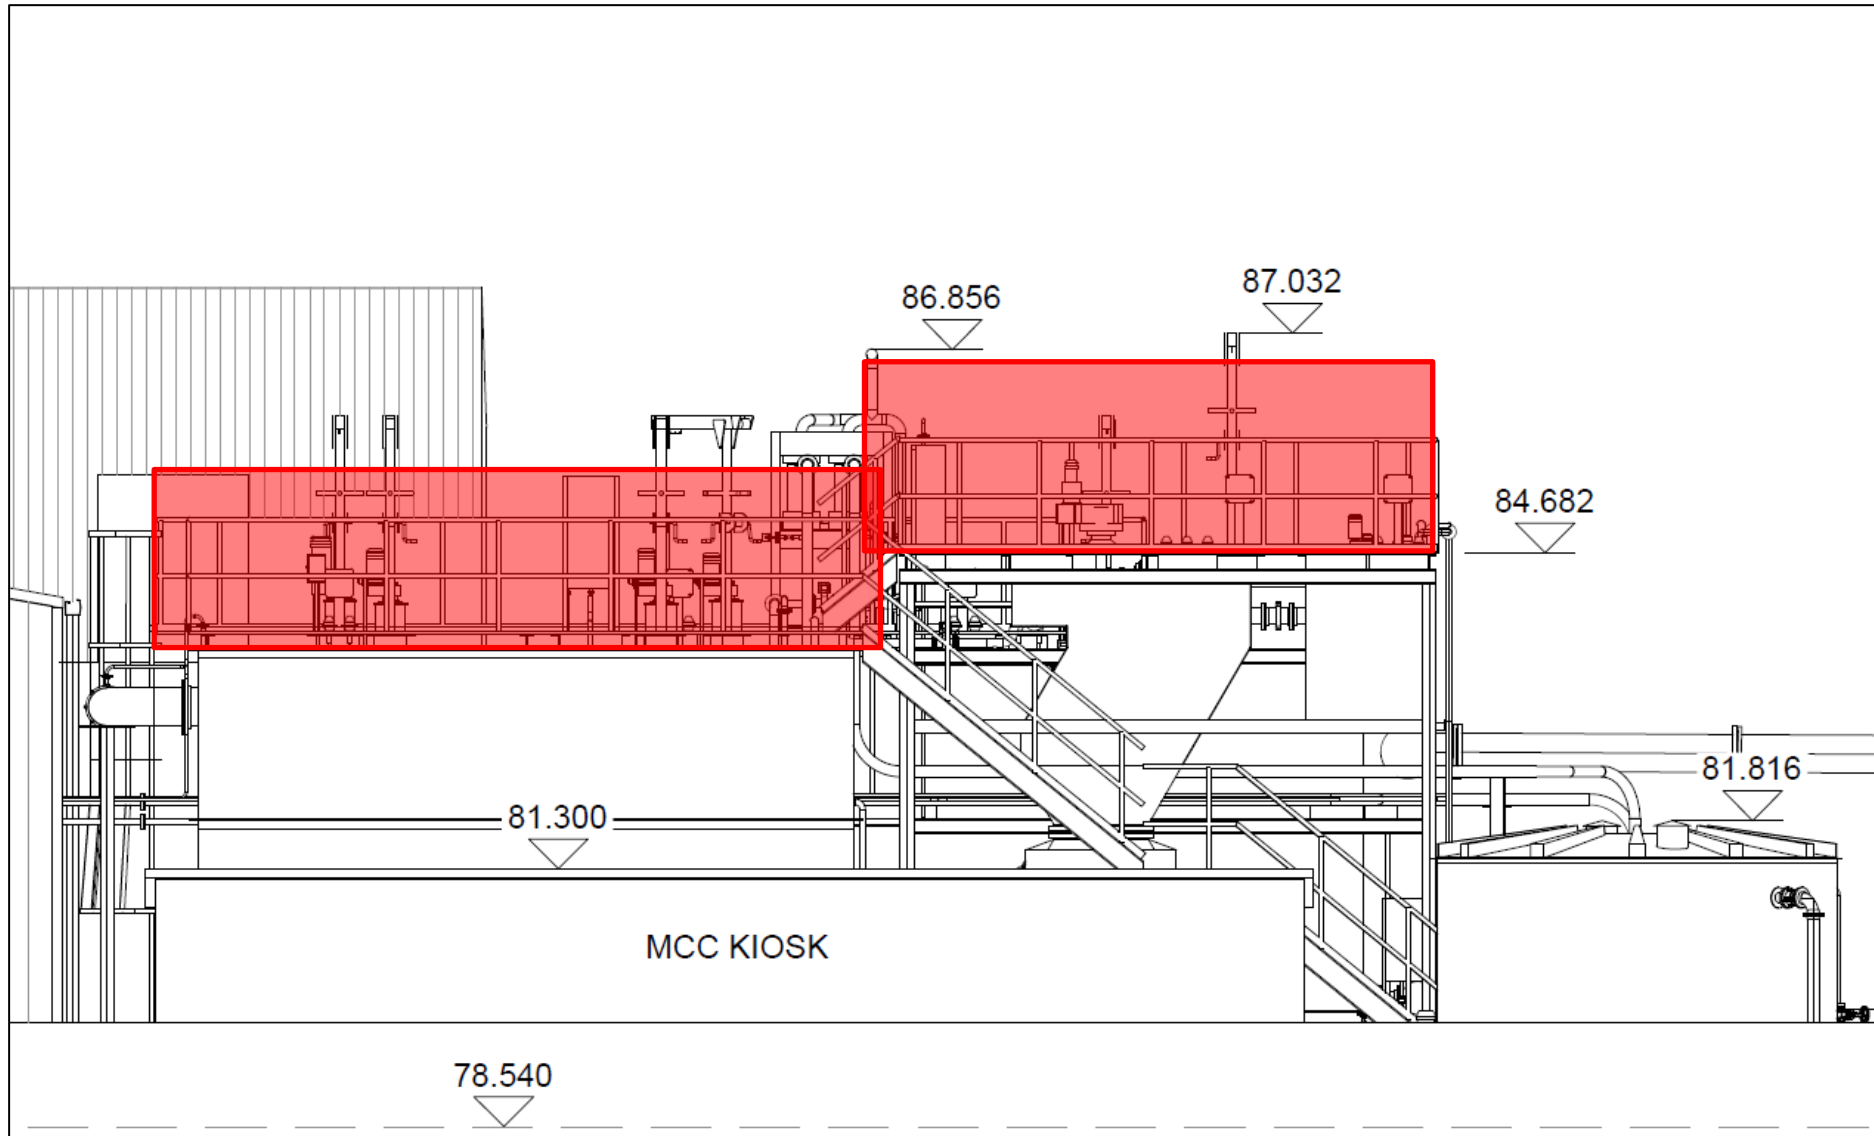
ELEVATION DRAWING INDICATING LOCATION OF RECOMMENDED 2M NOISE BARRIER
